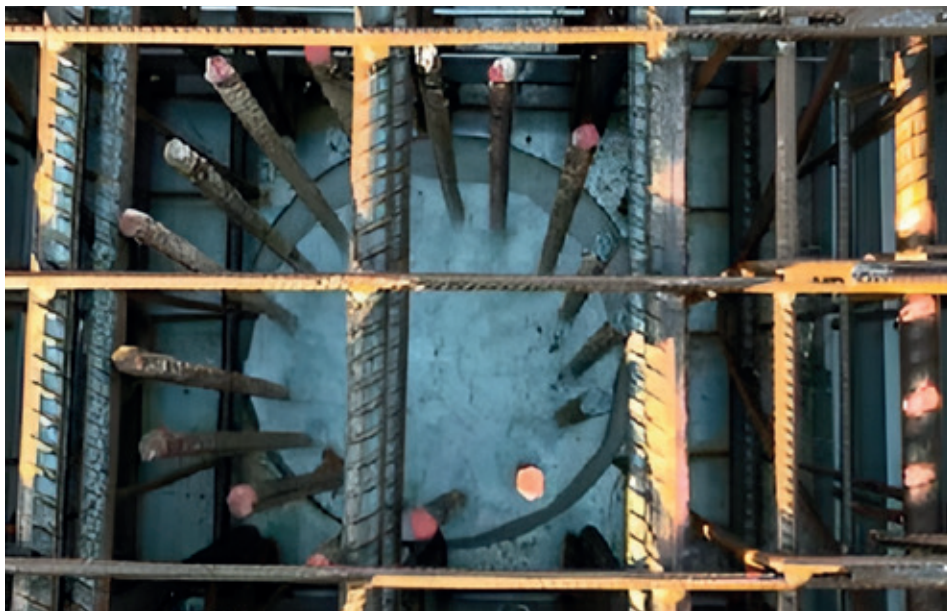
The pier cap is placed on top of the piles before concrete is poured.
